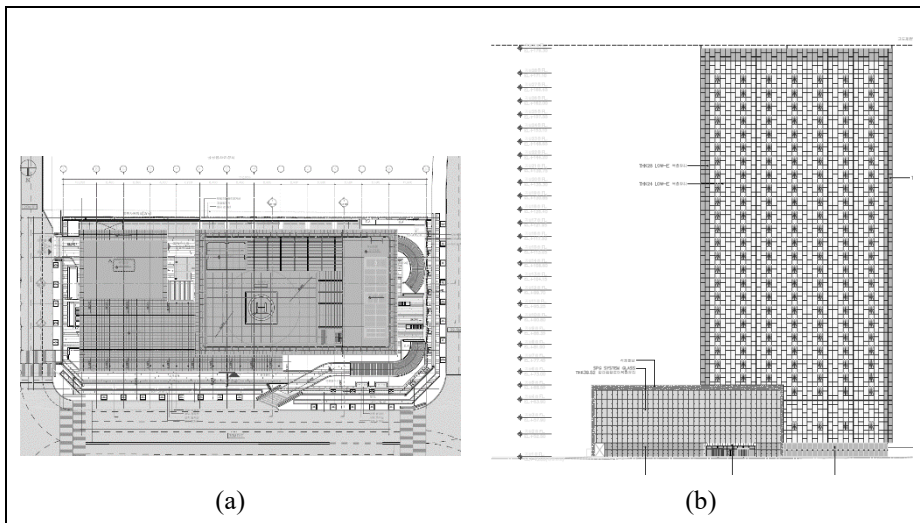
(a) Site plan drawing and (b) façade of target project
